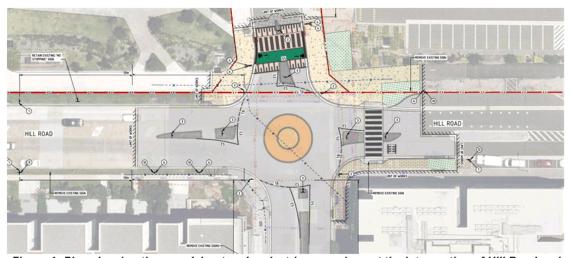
Plan showing the roundabout and pedestrian crossings at the intersection of Hill Road and Burroway Road, Wentworth Point
